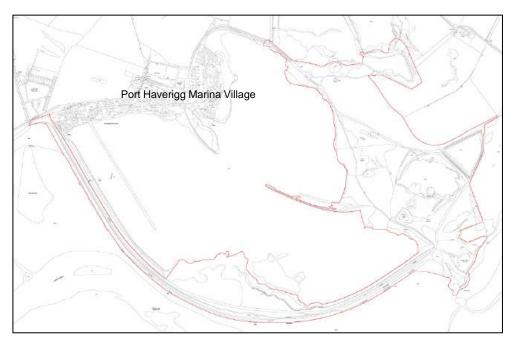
Site Location Plan (site boundary shown in red). Extract from received Site Location Plan, shown in Appendix A.
